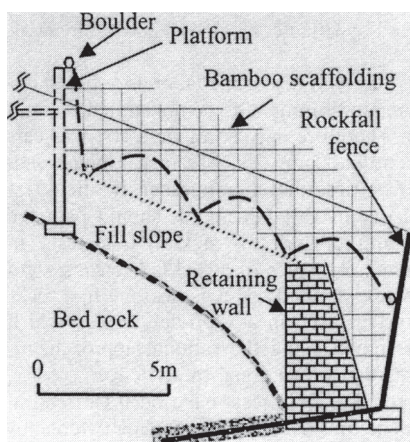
A typical section for Figure 1 at Tung Shan Terrace
